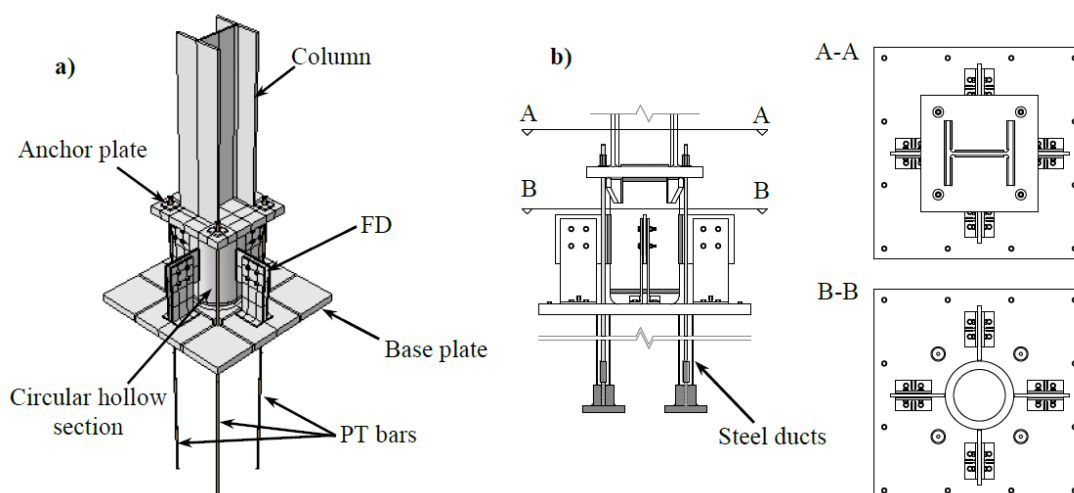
Freddi et. al., 2017 [144] Rocking damage-free steel CB: a) 3D view; b) Lateral and sections views.
